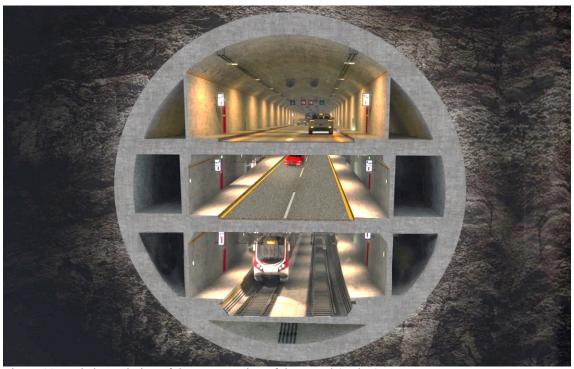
artistic rendering of the cross section of the tunnel (author)
